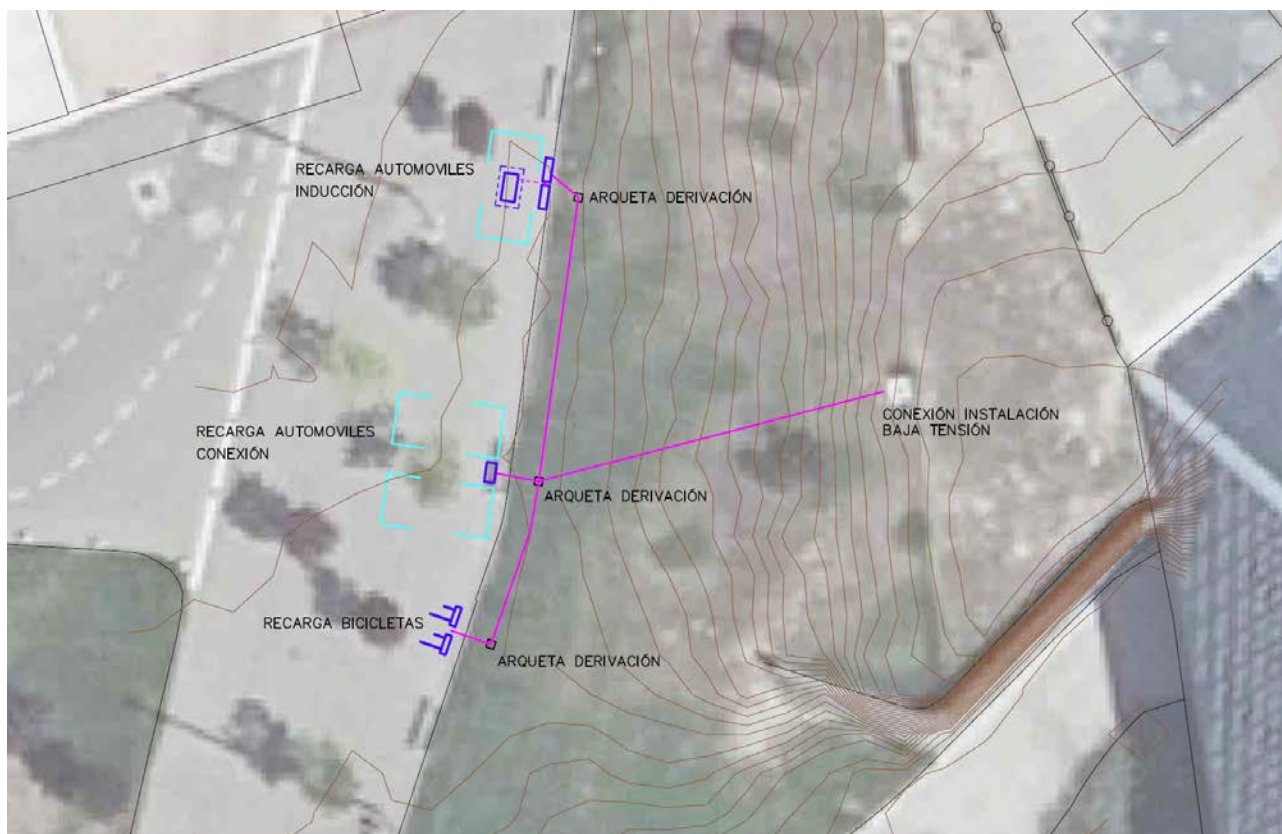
Civil works plan for the UC6 and UC7 systems.
